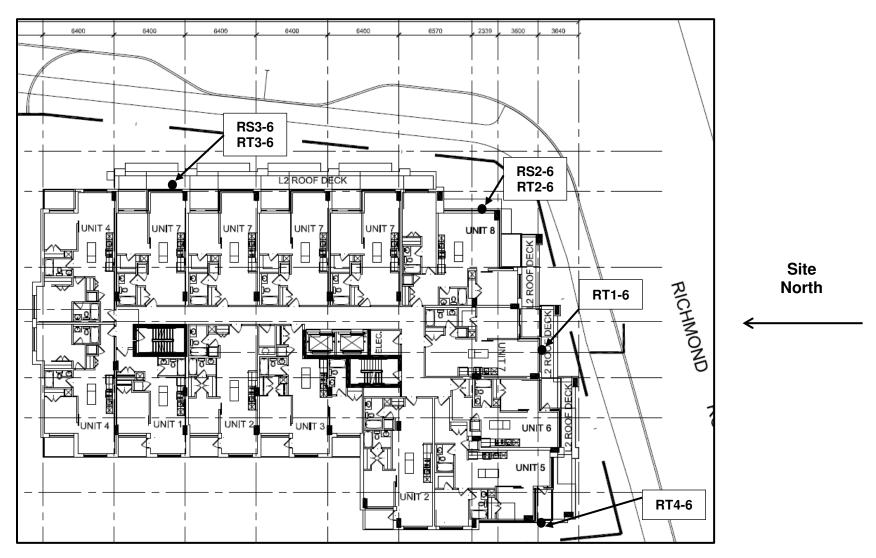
9th Floor Plan, 175 Richmond Road, 9-storey Building
